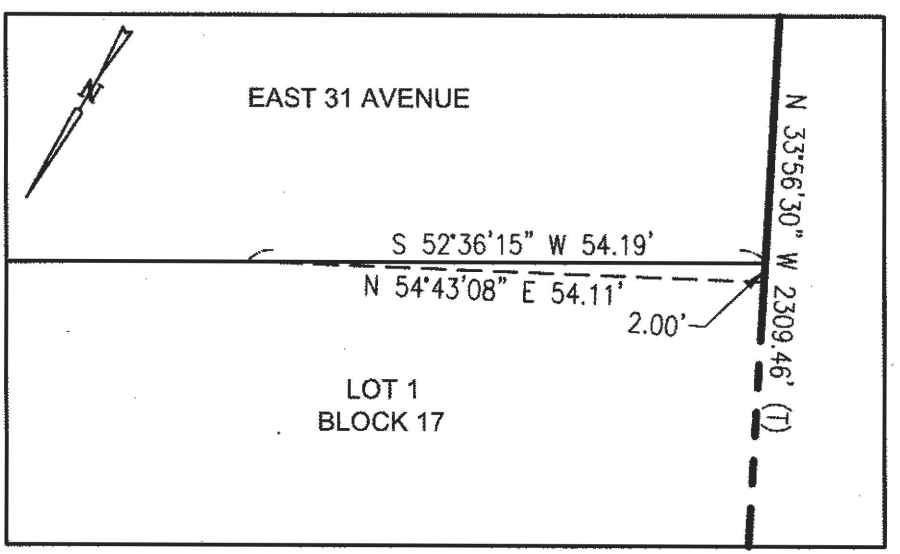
DETAIL 'A' - PUBLIC ACCESS EASEMENT (P.A.E.)
